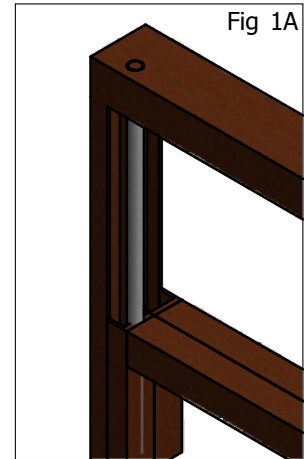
A: If window is already installed. Fully lower the sash before attempting to insert the balance into the machined groove in the sash or frame.
